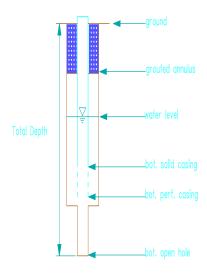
WATER USE PERMIT DETAILED INFORMATION
